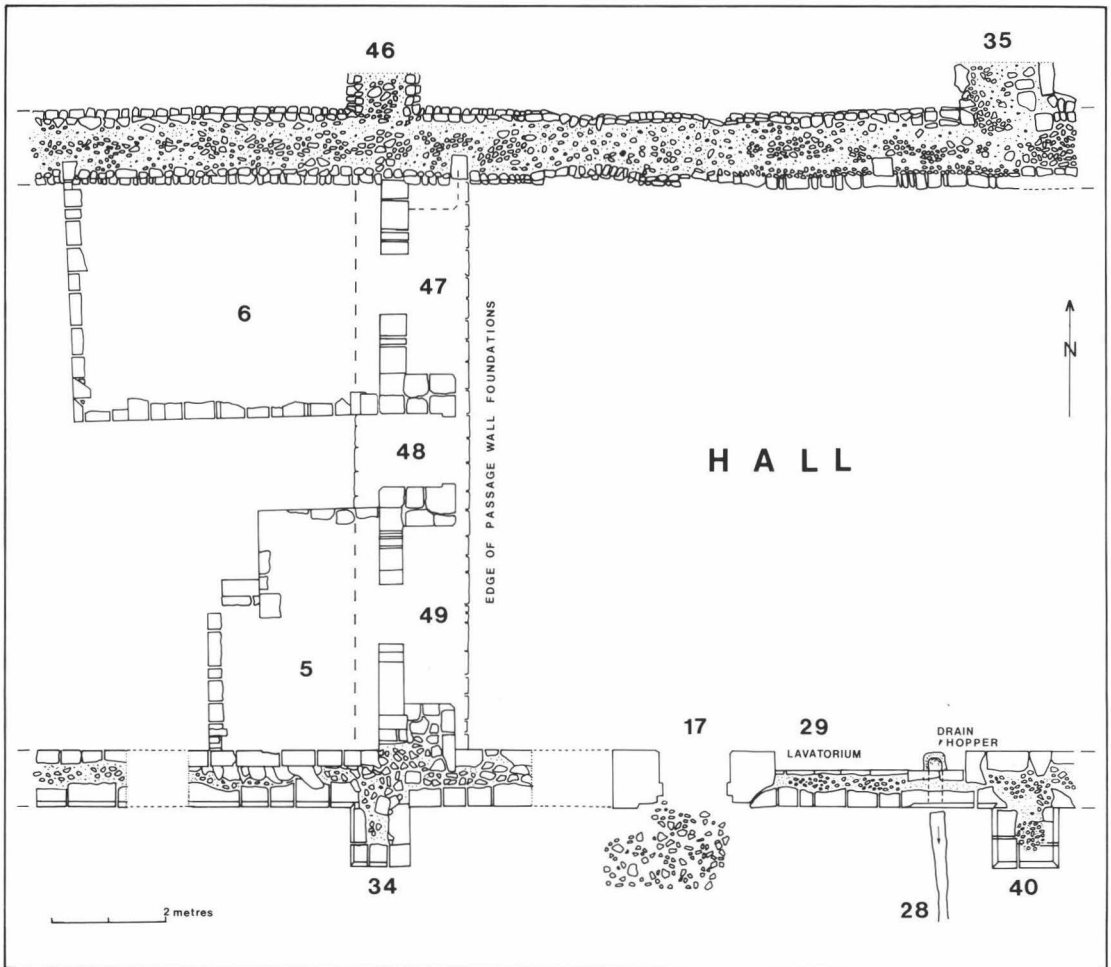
Detailed plan of the Phase 1 layout of the passage wall, the main south entrance and adjacent lavatorium.
